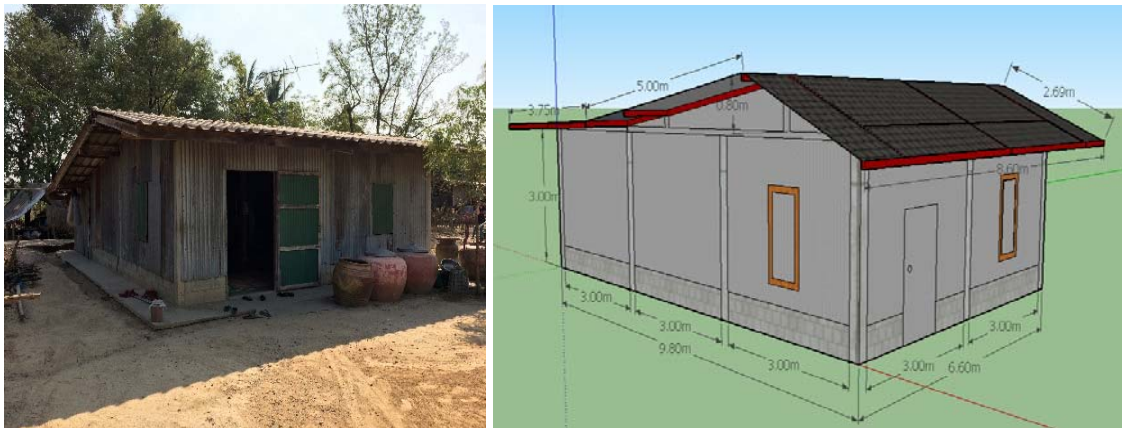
1-storey house constructed by zinc sheet of Central Thailand.
